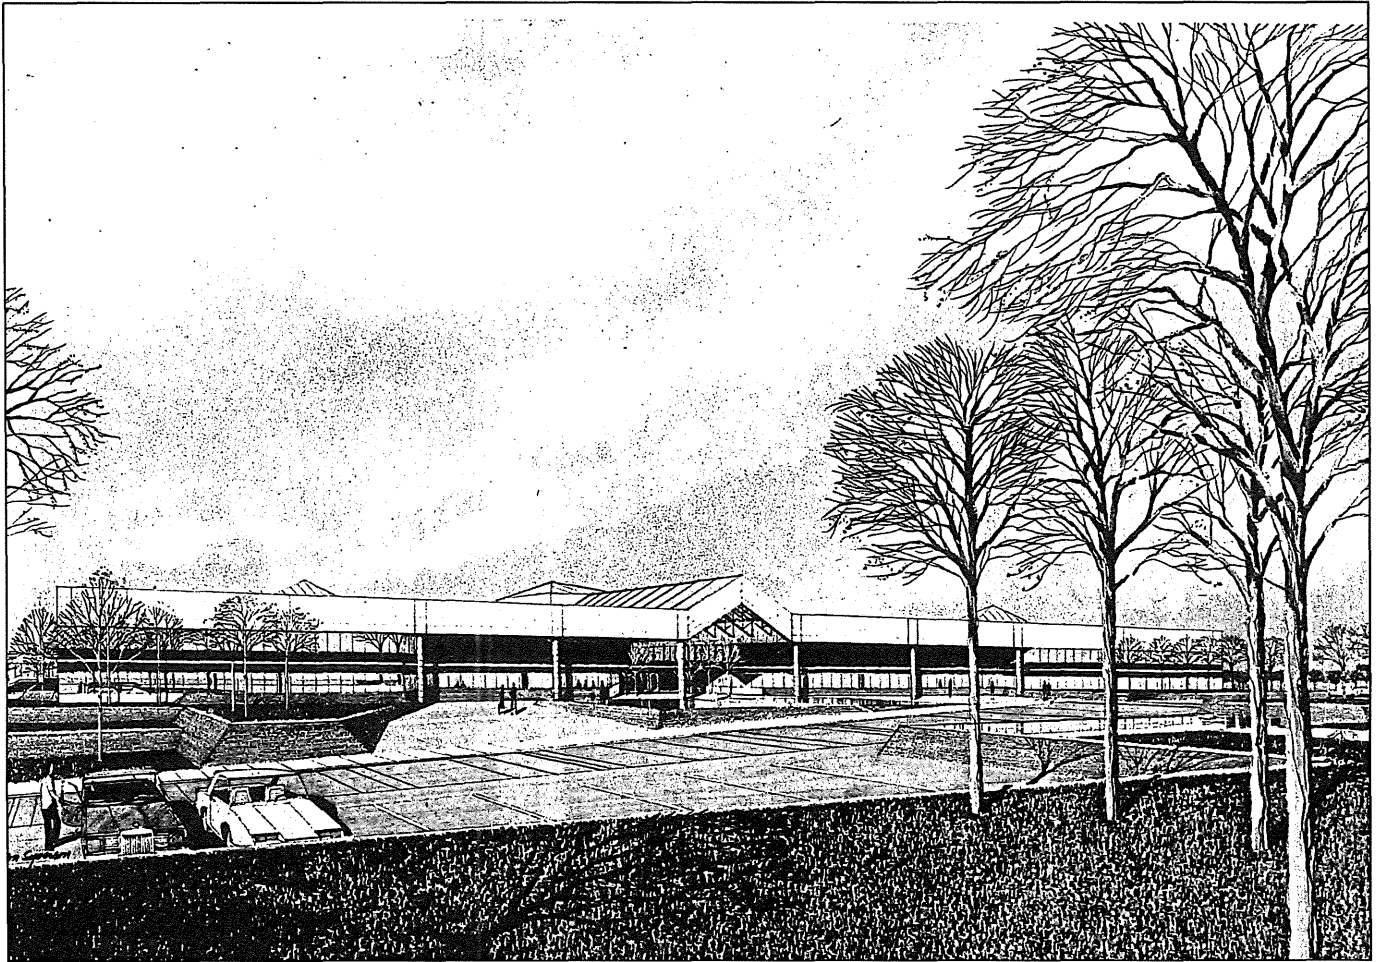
Architects' rendering of proposed addition to Honeywell Golden Valley Plant. Section closest to Douglas Drive, 1982. HGA Architects.
